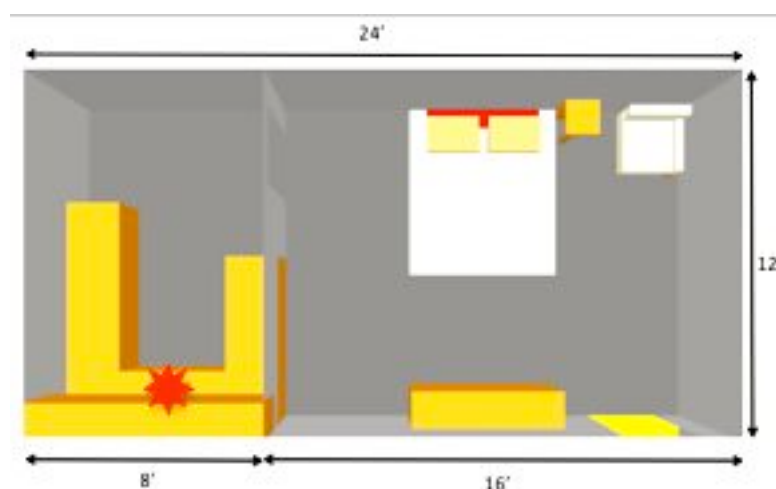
Layout of Denver test structure. 8' x 12' Kitchen to left with open doorway. 12' x 16' room to right with open doorway to exterior.
